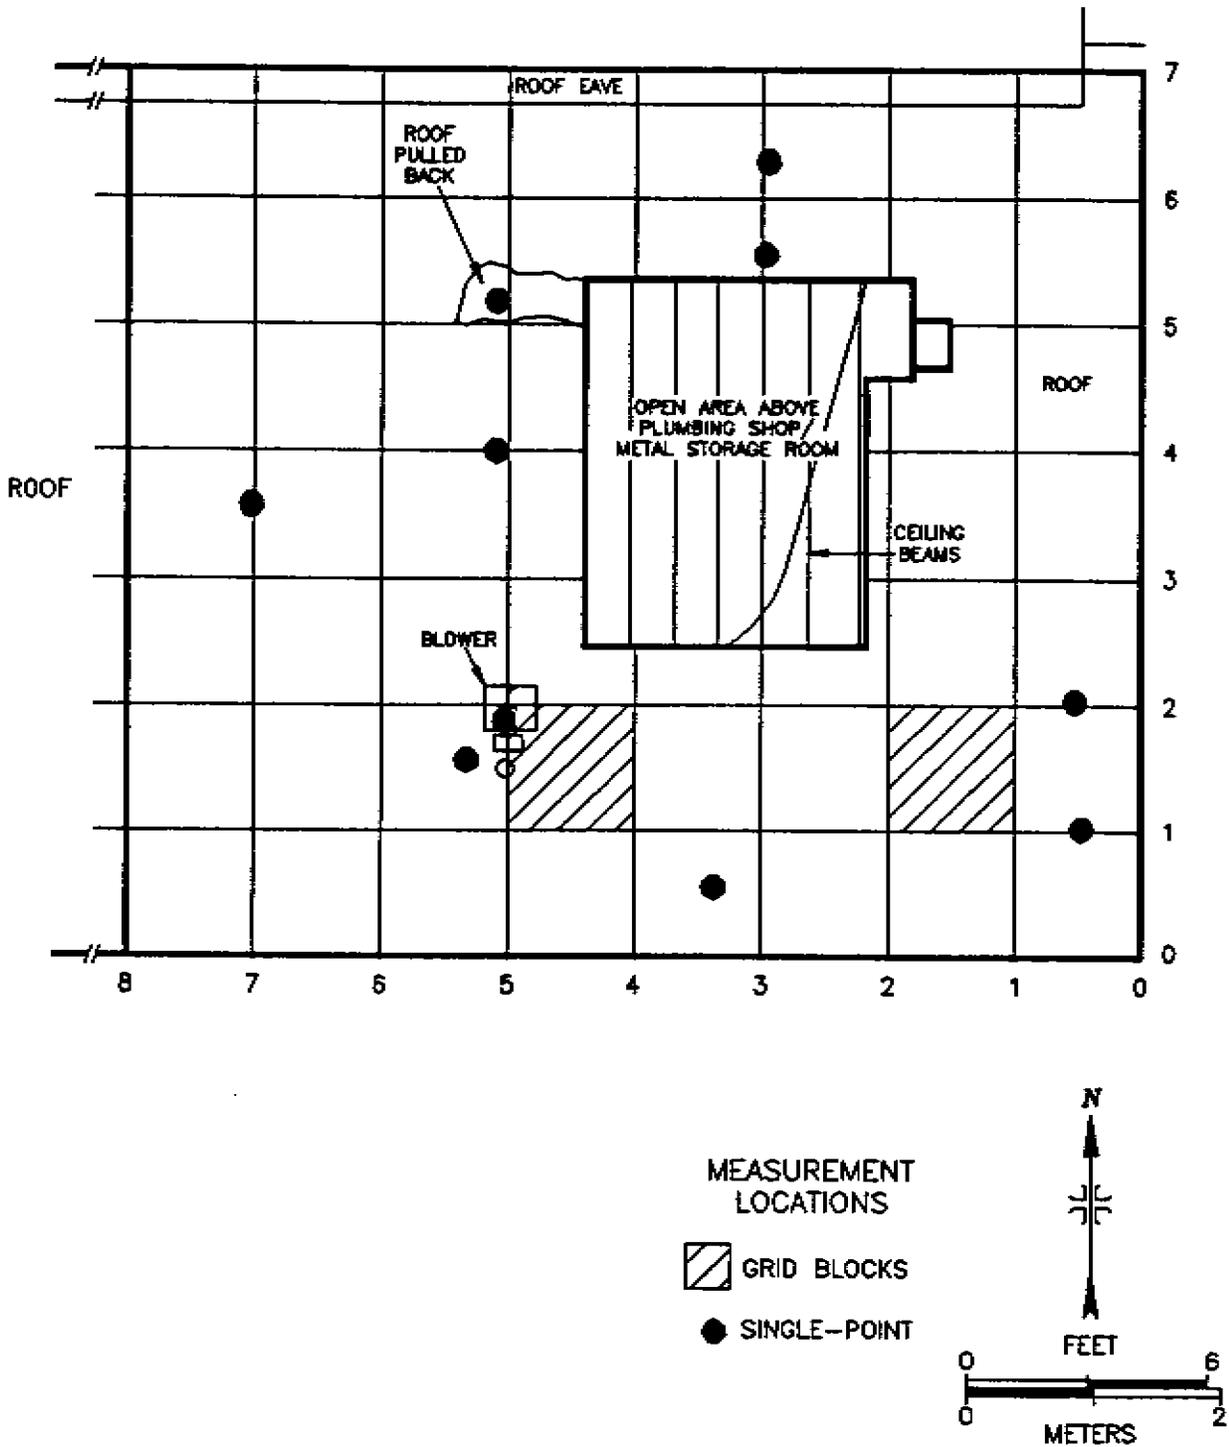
Building 5, Roof, Southeast Corner Above Plumbing Shop/Metal Storage Room, Indicating Measurement Locations
